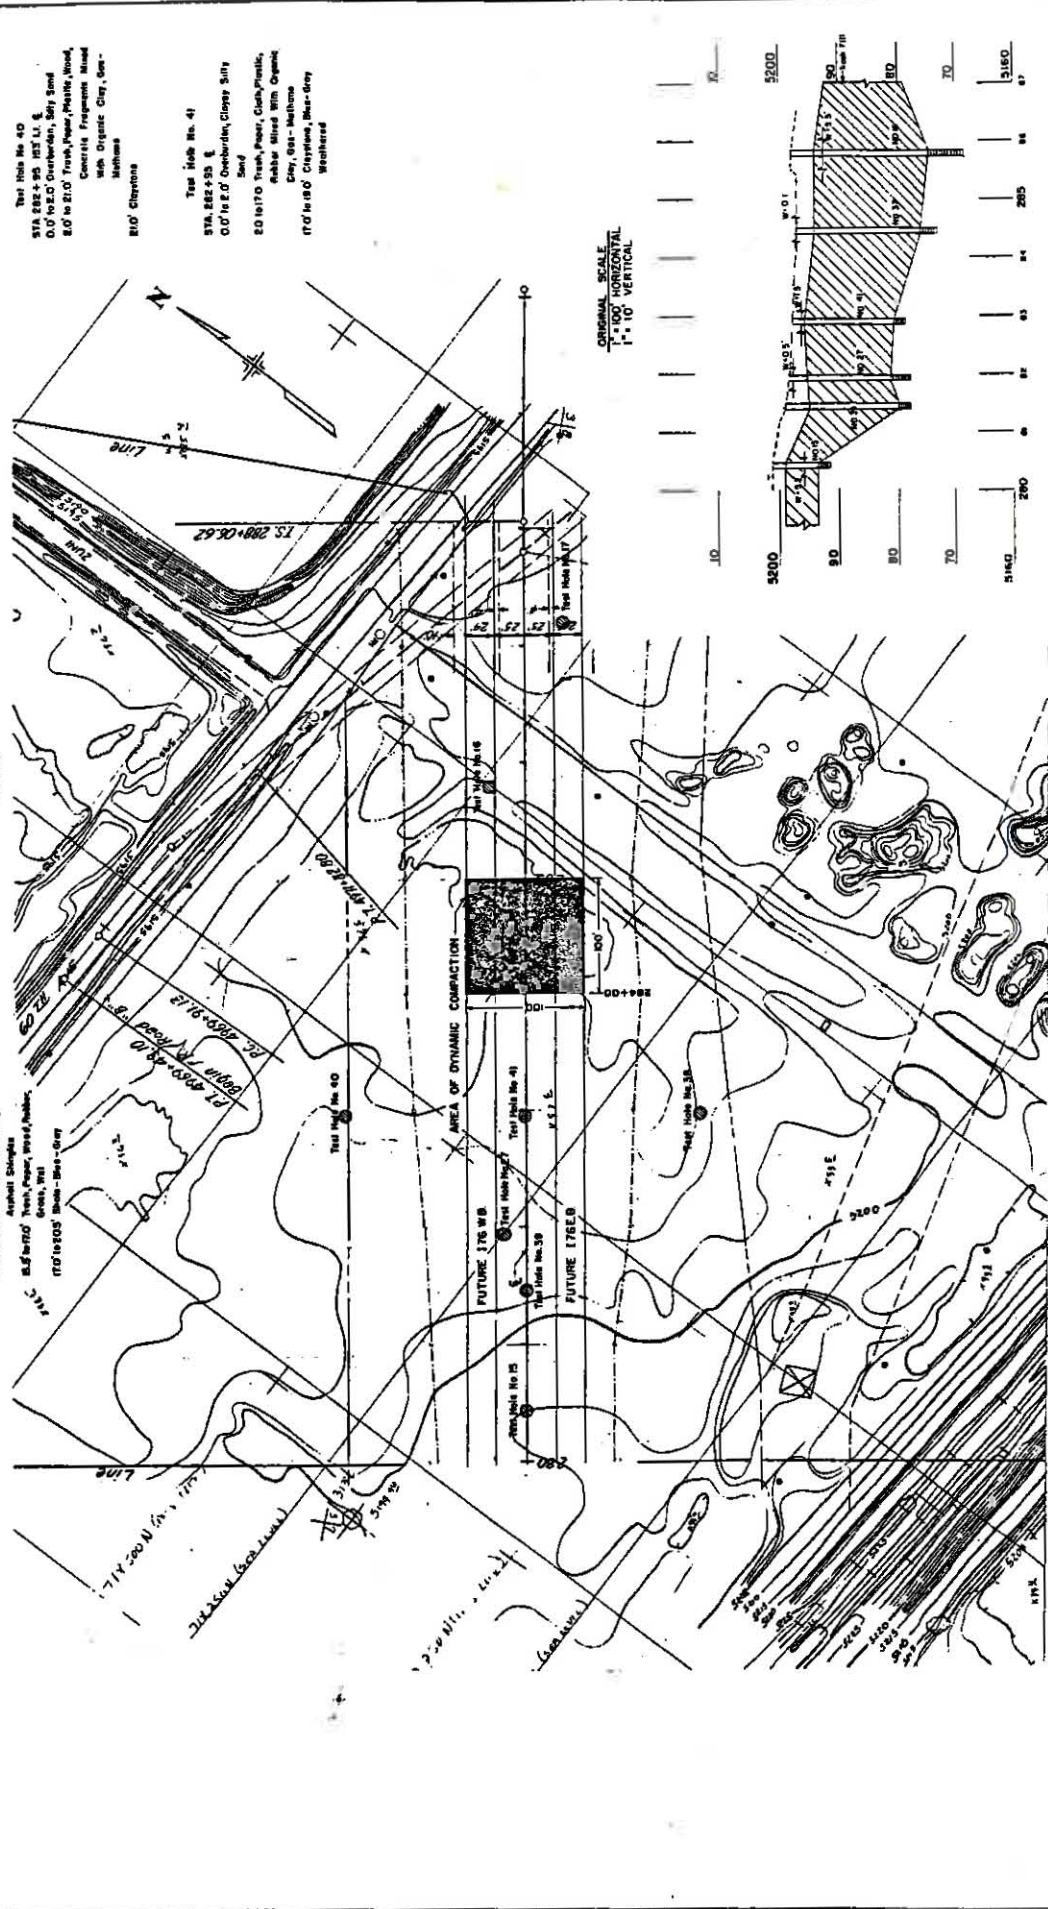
LOCATION OF SITE A WITH TEST SECTION NO.1
